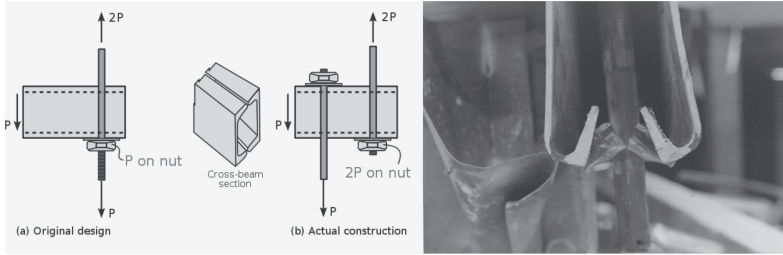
Details of the As Built and Original Hanger Rod Arrangement of the Walkway (Left) and the Damage (Right)
